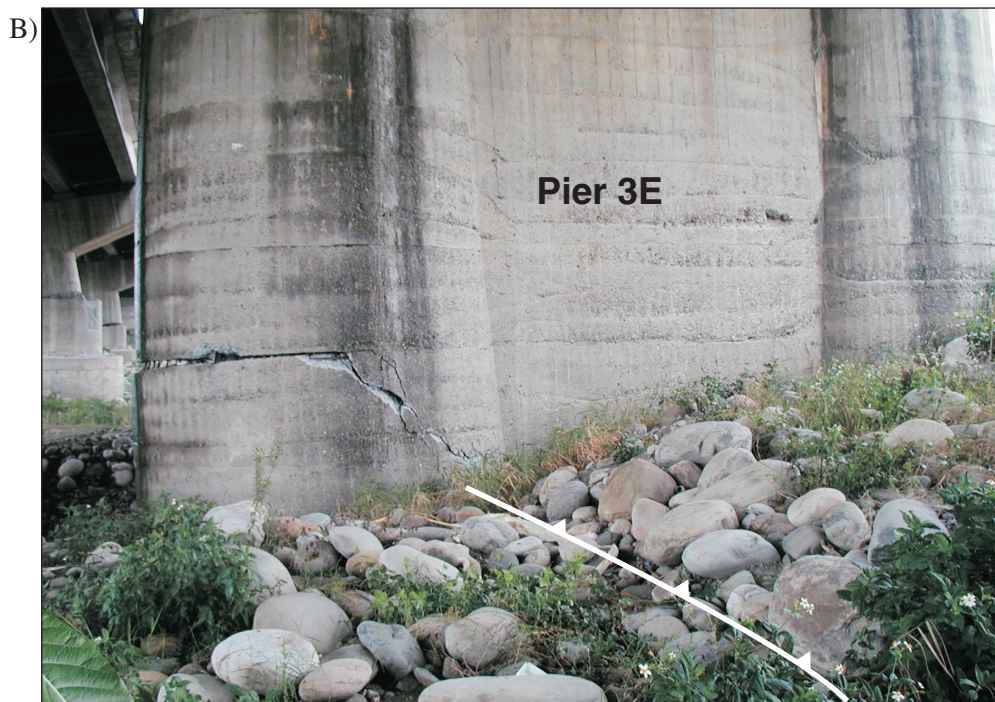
Photograph looking north at Pier 3E along the eastern fault strand, showing east-dipping fracture in pier and west-facing fault scarp (photo taken April 15, 2000).
